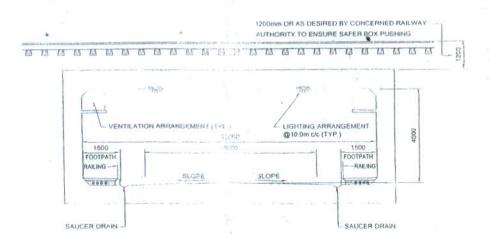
Typical Cross Section for Fallway Portion-Precast Box (Type-5)
